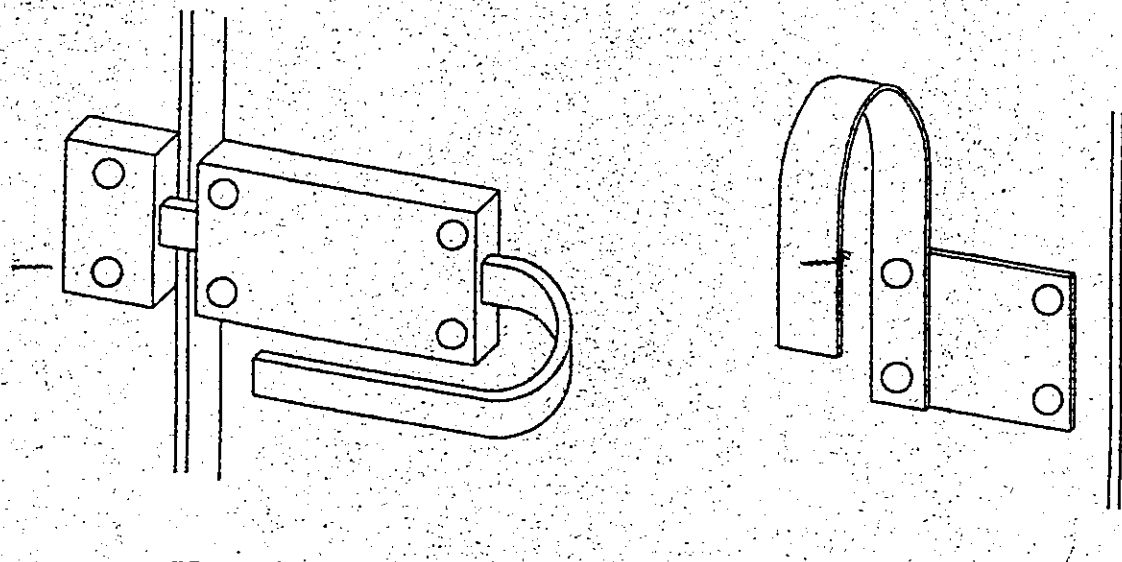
B ACCESSIBLE STALL DOOR HARDWARE
